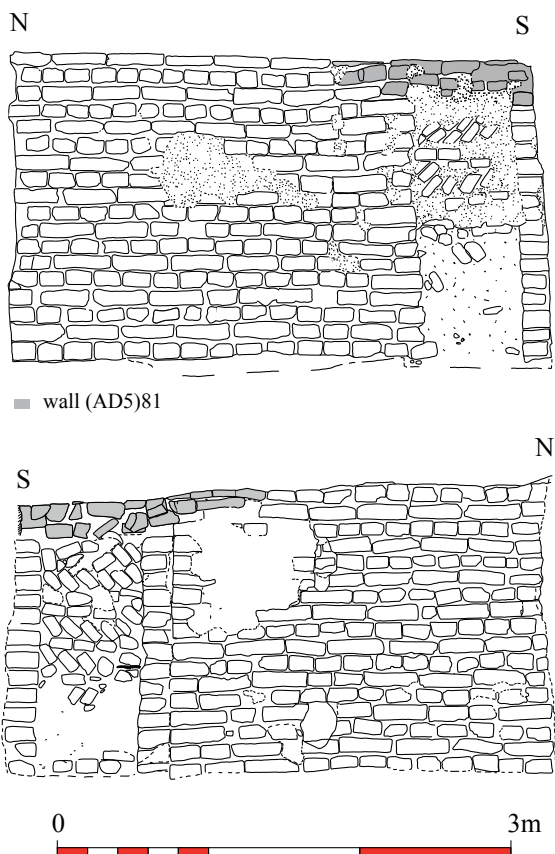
Building A2: elevations of the party wall between Rooms VI and VII (scale 1:50).
